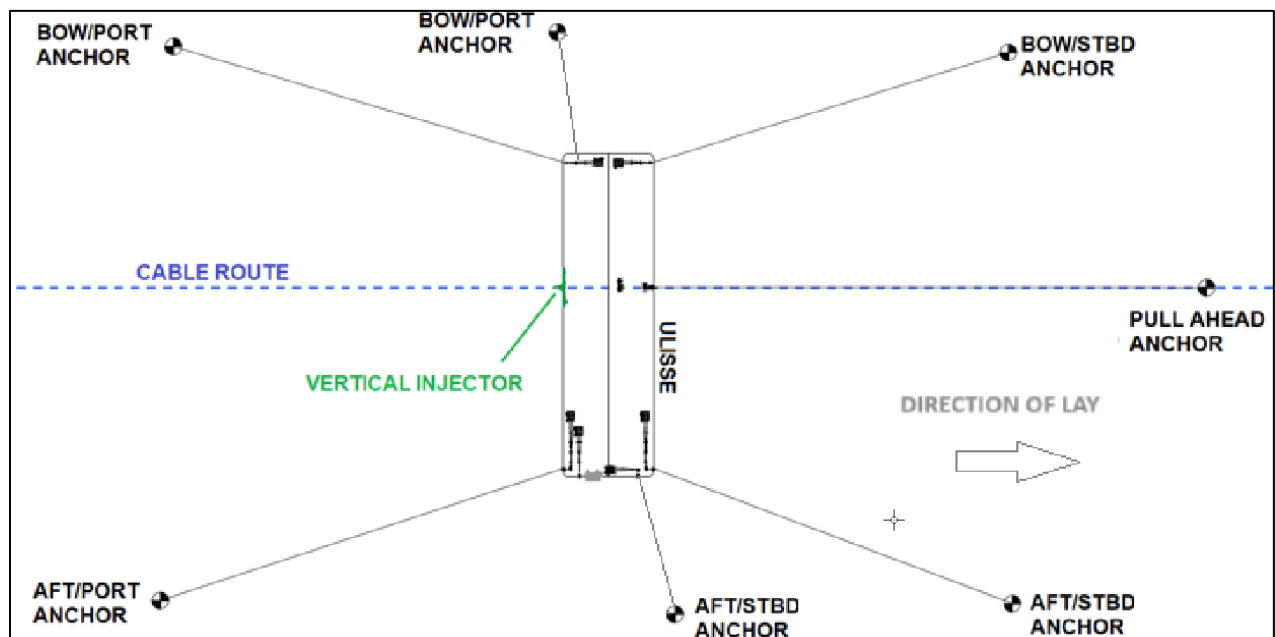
Cable Lay Barge ULISSE planned anchor configuration.
